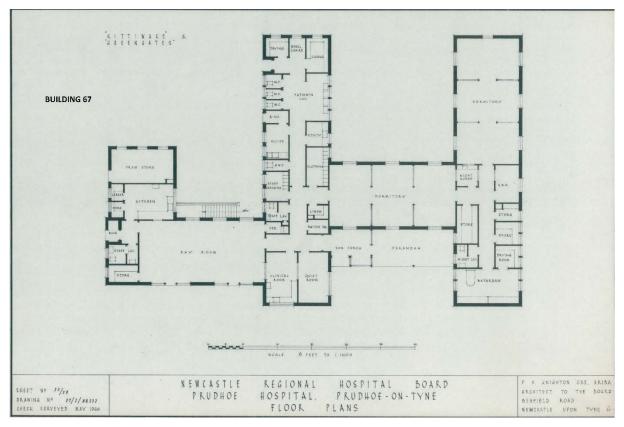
Building 66-7, Kittiwake and Nightingale, historic ground plan.
